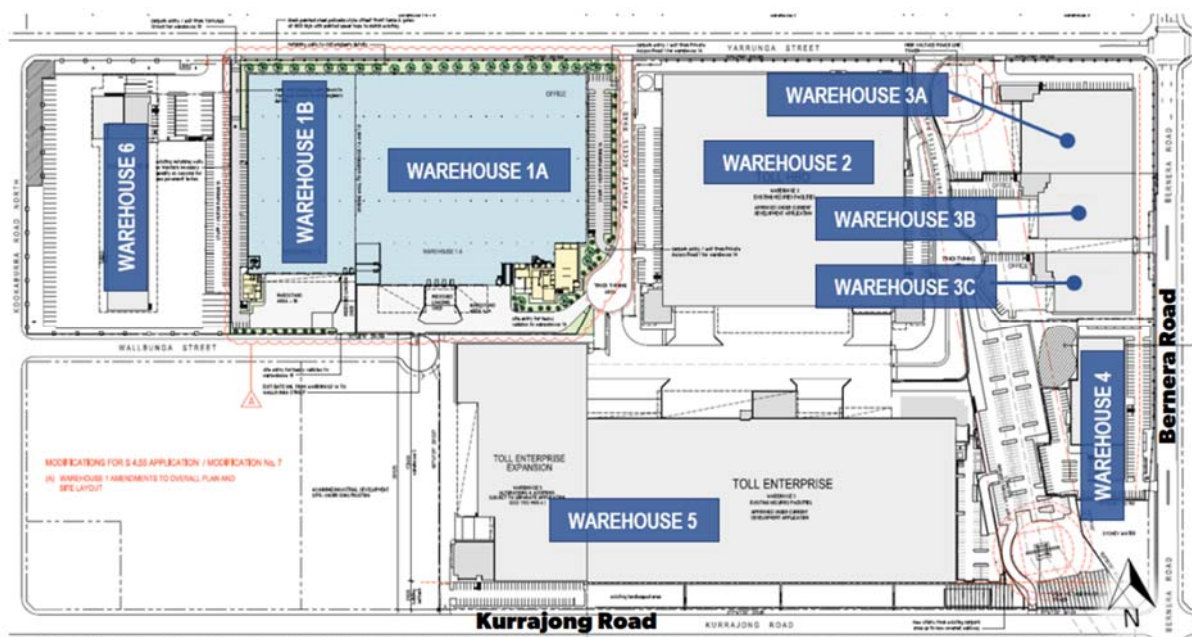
| Approved Site Plan (modified under SSD 7155 MOD 7)
